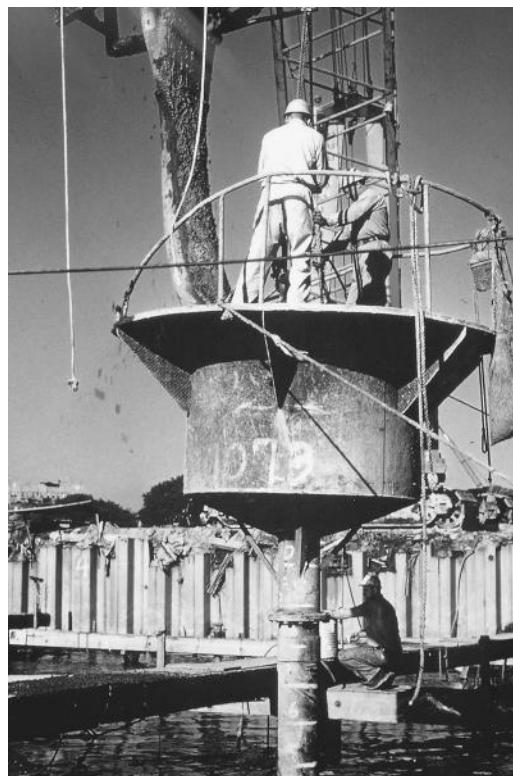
Placing underwater concrete through hopper and tremie pipe for Verrazano Narrows Bridge, New York.
